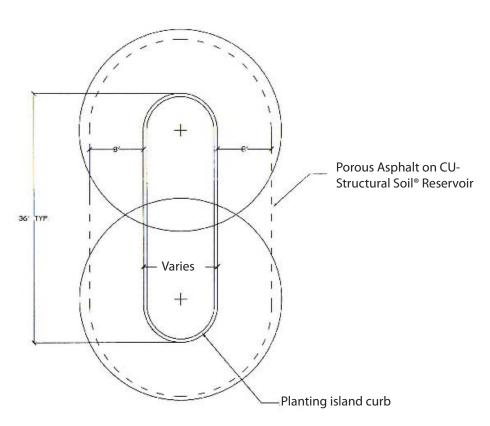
Potential use of CU-Structural Soil[®] to enlarge planting islands in parking lots without taking up parking space.
